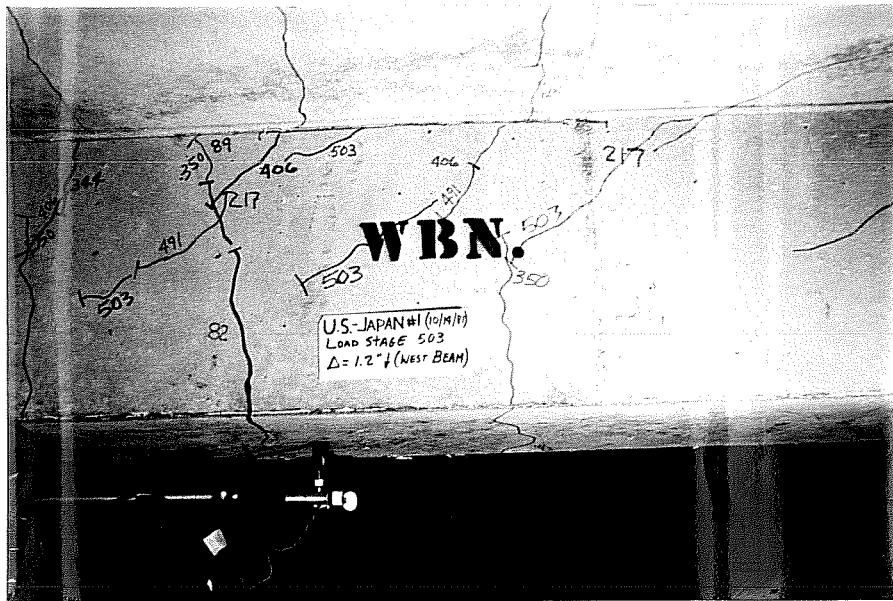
Diagonal cracks in west beam, Test 4
